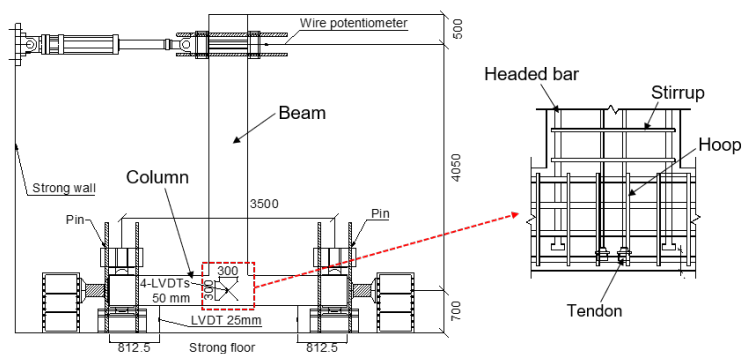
Lateral cyclic loading test of post-tensioned RC beam-column connections.
